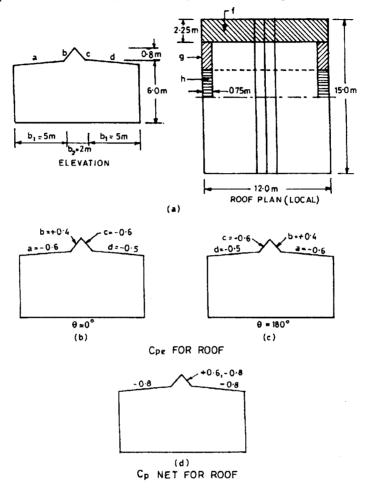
RETANGULAR CLAD BUILDING WITH SKYLIGHT ROOF
